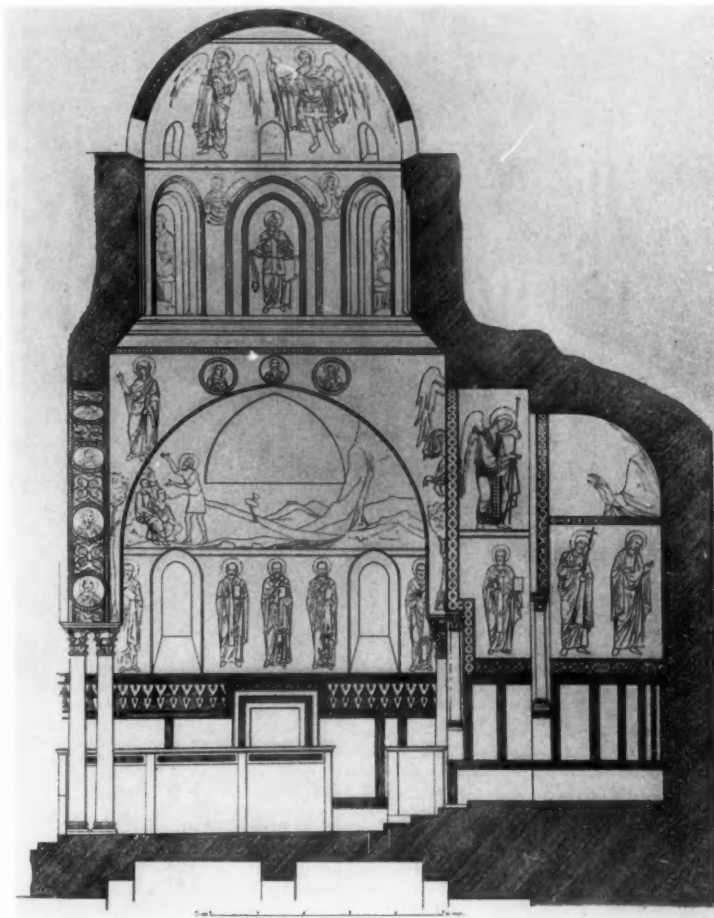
Cappella Palatina, Sanctuary, longitudinal section, looking north (after Terzi)
